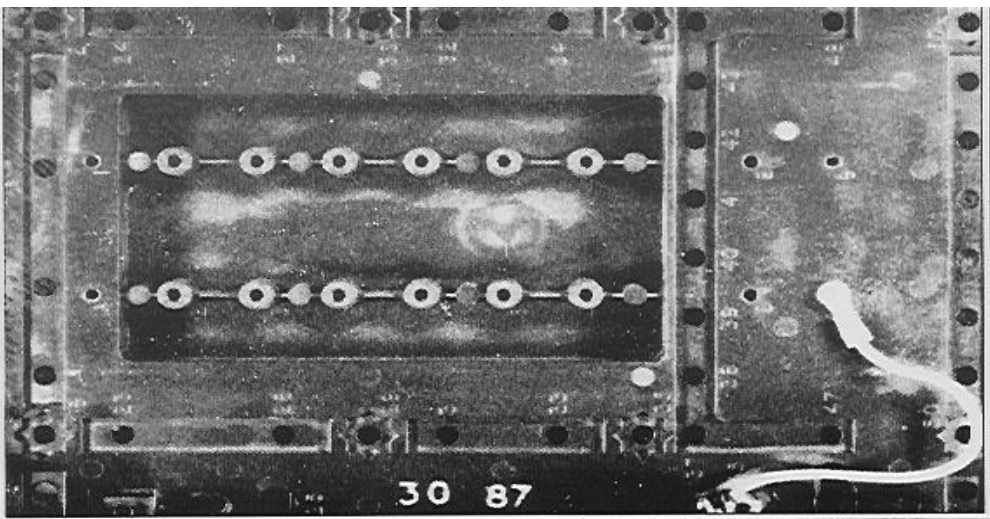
Front View of a Fully Equipped Box Connection With Cover Removed
